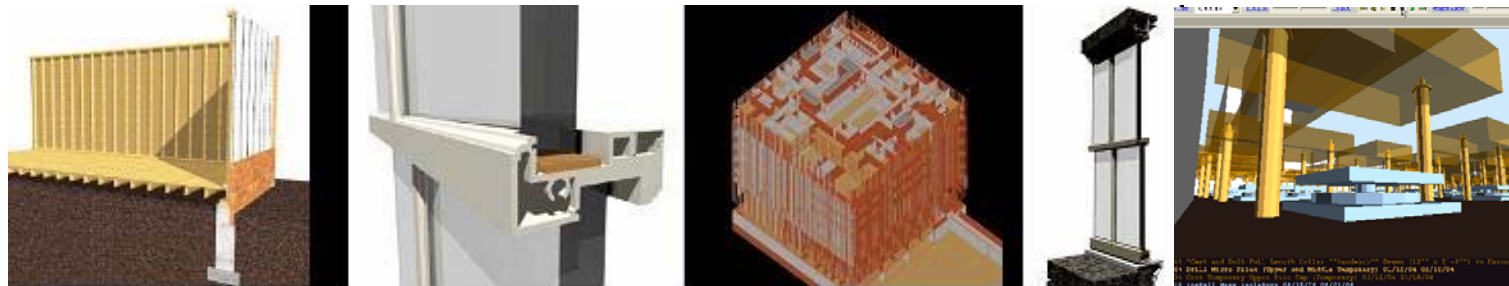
Virtual Construction Detailing from GSA Pilot Project
